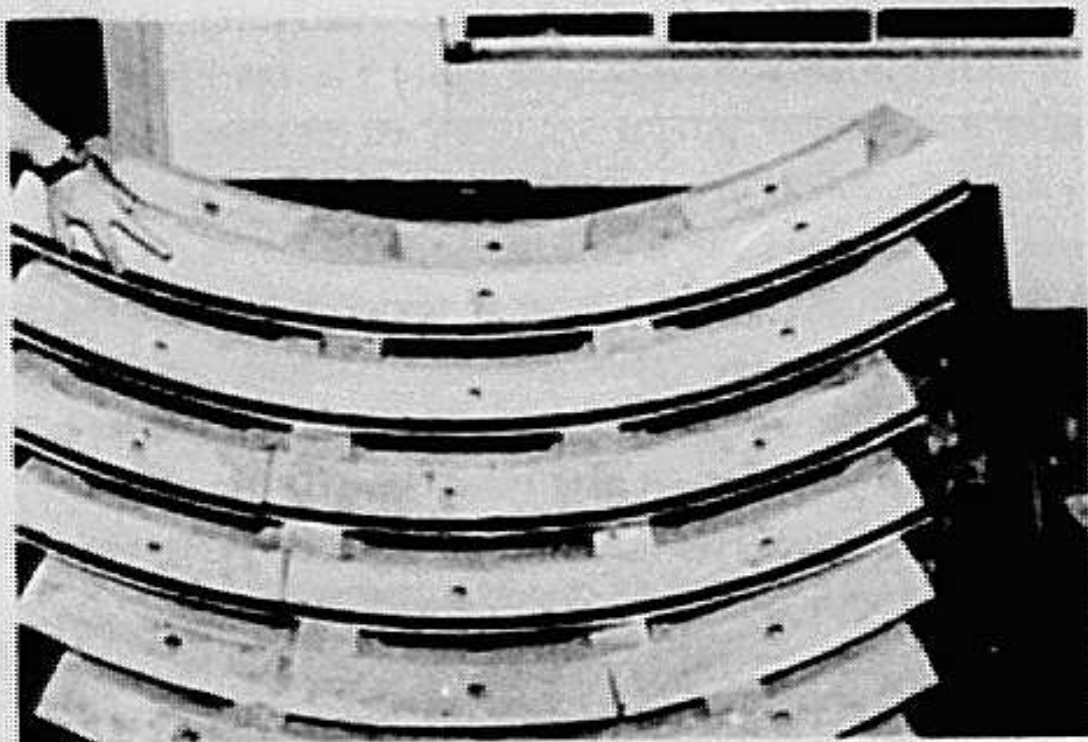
LOCAL COMPRESSTON SEAL WITH CALKING GROOVE
